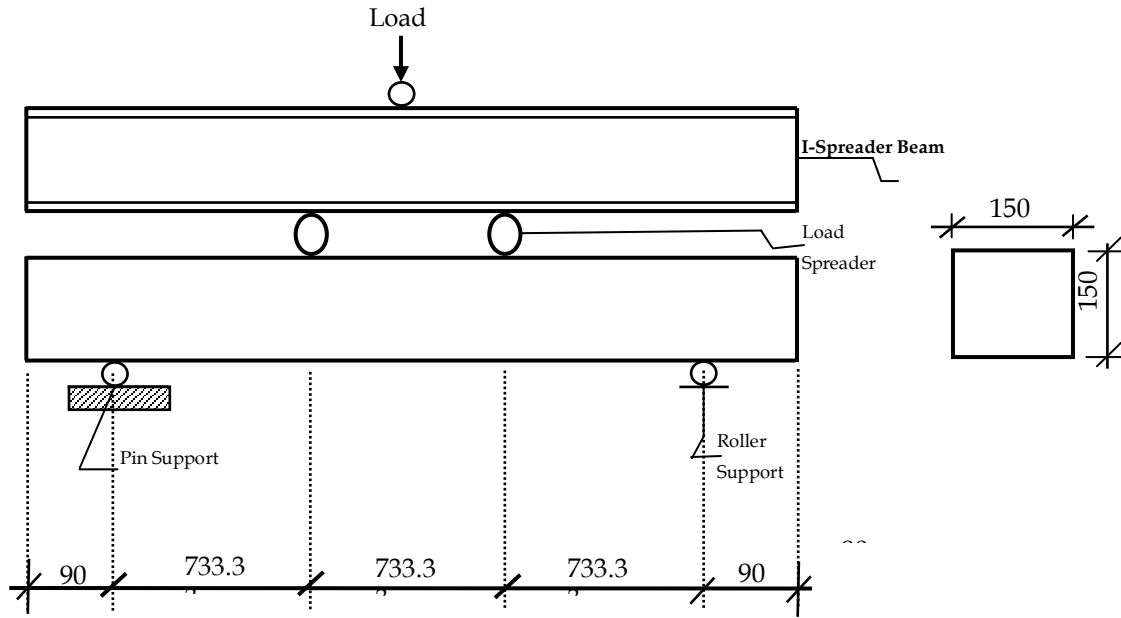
The Loading Arrangement for the Third Pont Loading Arrangement
